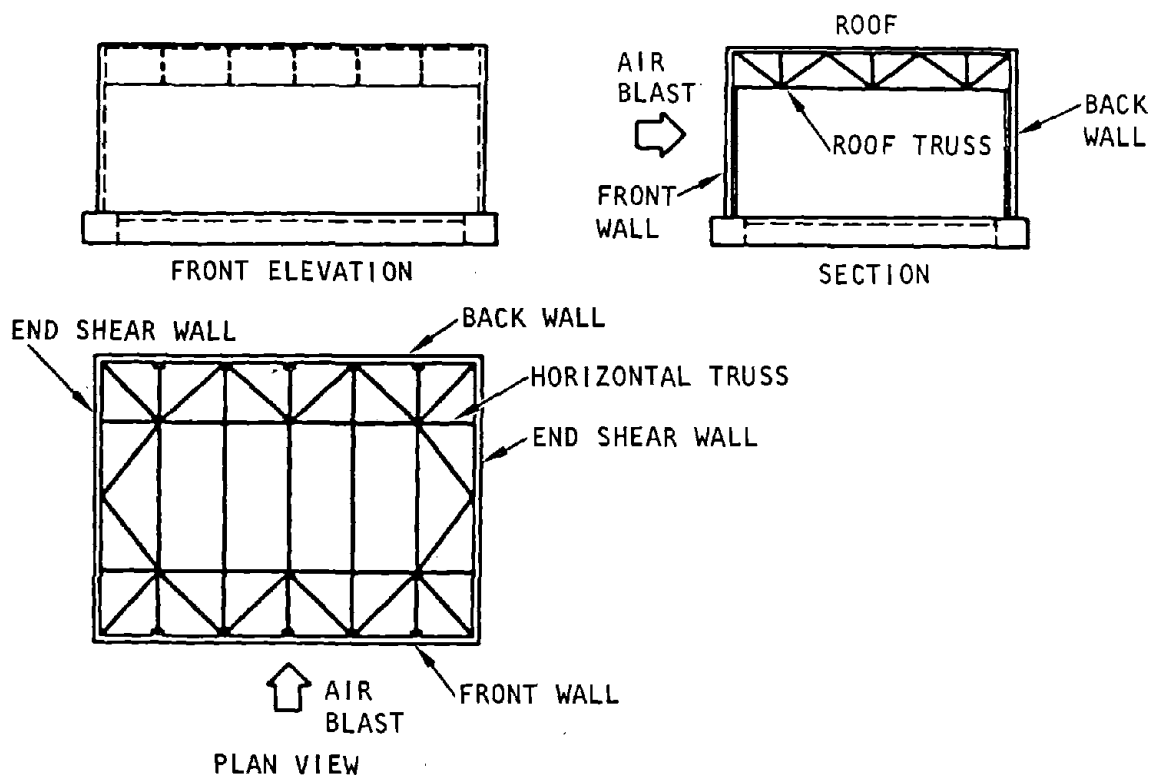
Shear Wall Structures with Steel Framing (COE, 1958)
